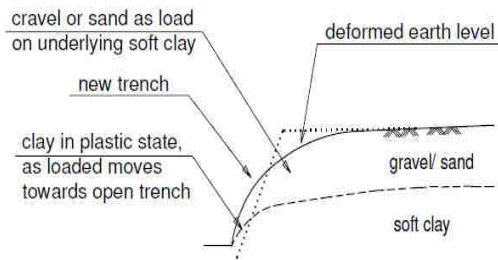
Visual demonstration. Upper layer consists of gravel or sand. No cracking due to excavation.
